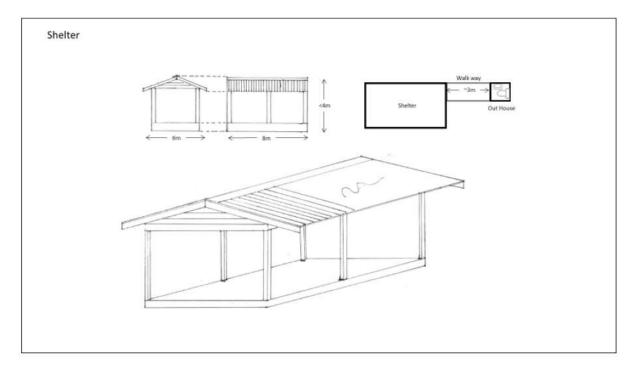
Drawing- typical site shelter structure and camp kitchen form
